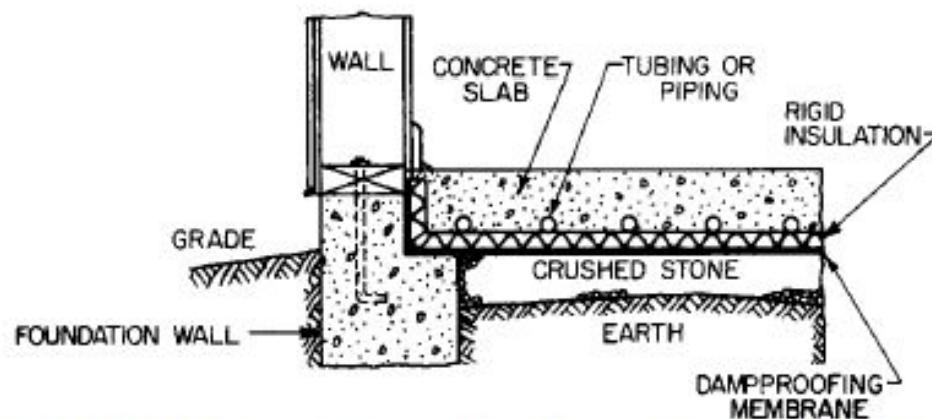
Pipe coil for radiant heating embedded in a floor slab on grade.
